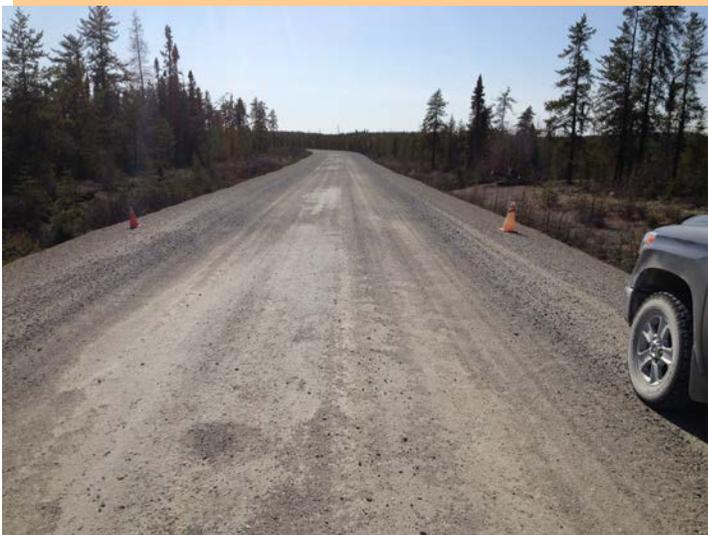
69+830 MTQ Frost heave deformation – facing east
